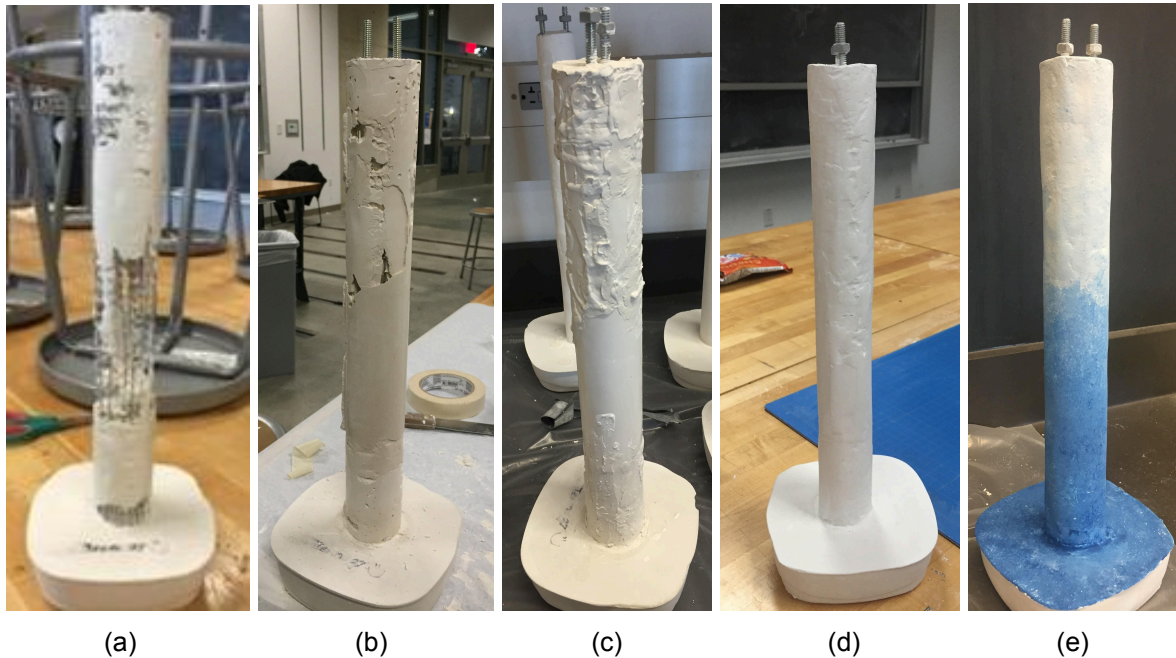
(a) column after the 1st pour, (b) column after the second pour, (c) column after the third pour, (d) column after sanding, (e) final column facade
